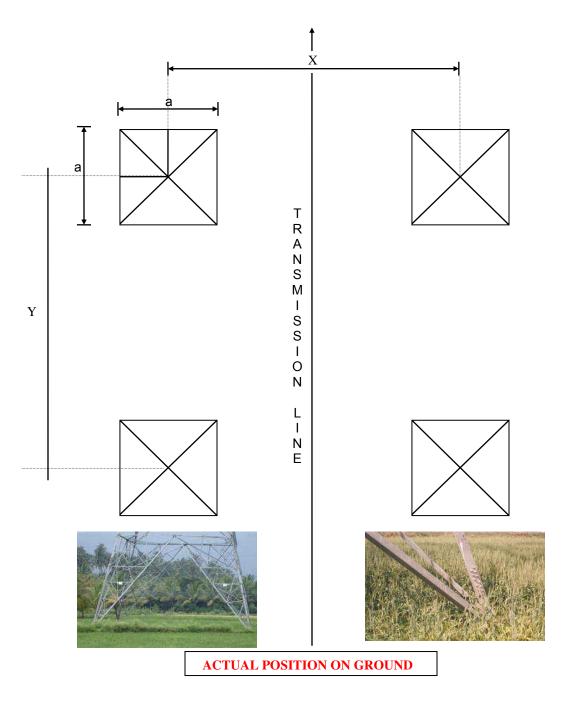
Typical Plan of Transmission Line Tower Footing
